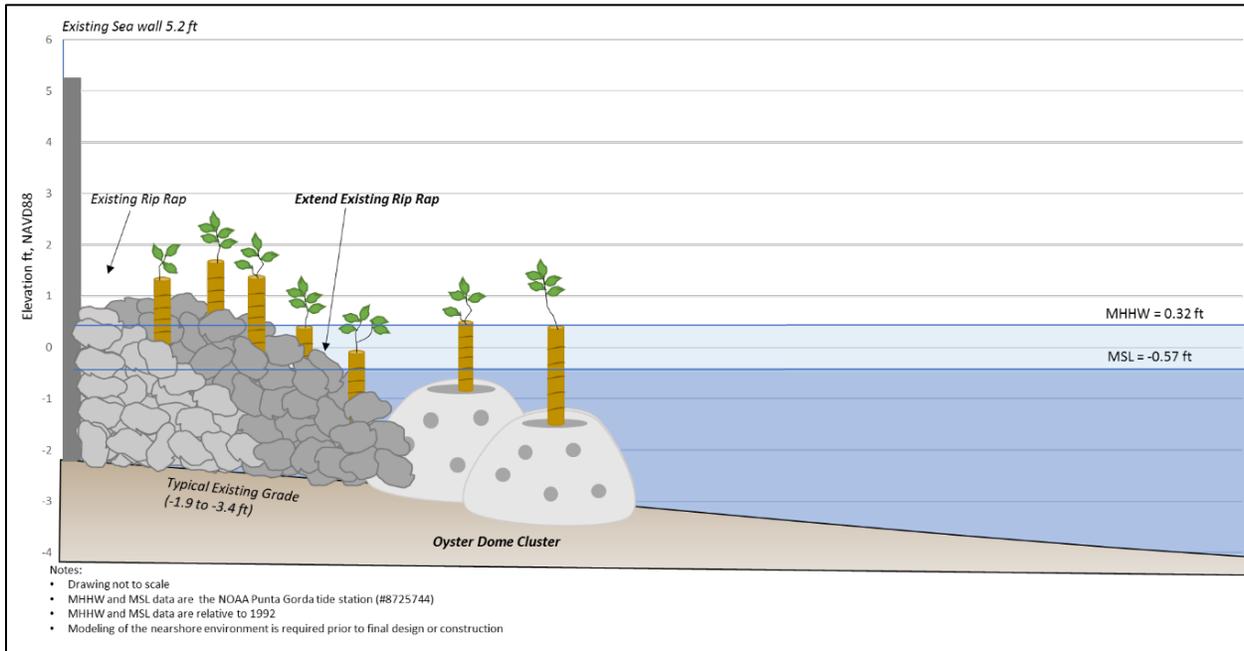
Sample Cross Section of Alternative 3 with Expansion of Riprap and Oyster Domes
